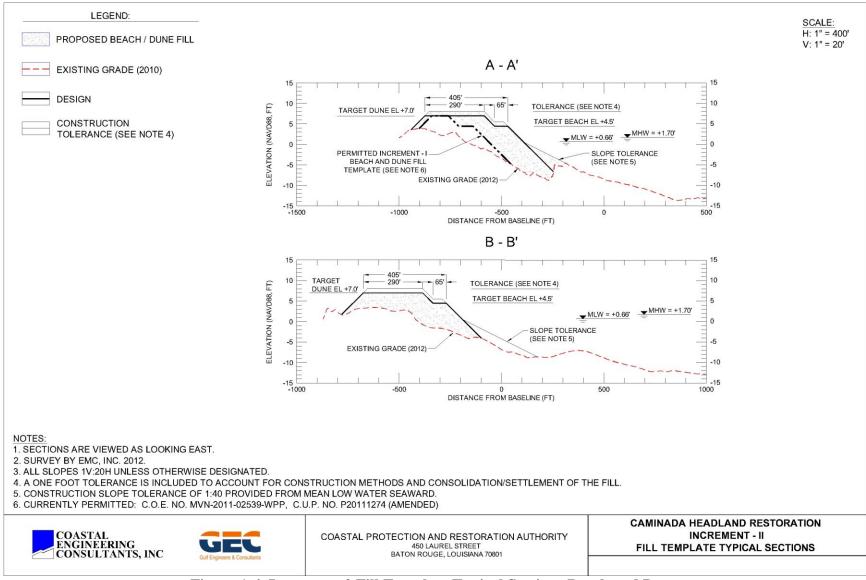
Increment 2 Fill Template Typical Sections Beach and Dune
